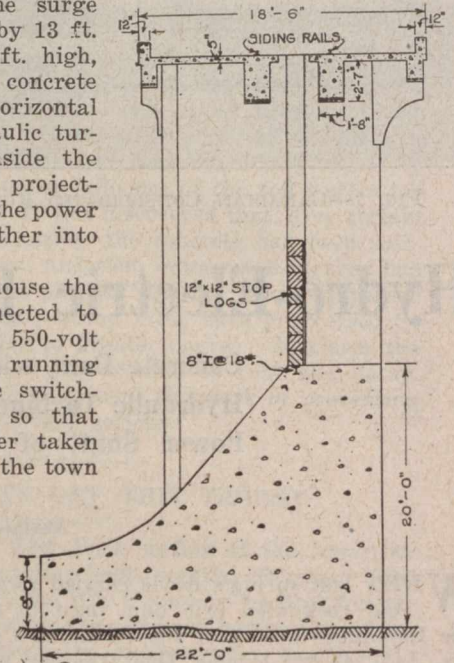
TYPICAL CROSS-SECTION THROUGH DAM
